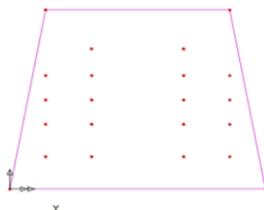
Cross-section for the monoblock prestressed concrete sleeper
